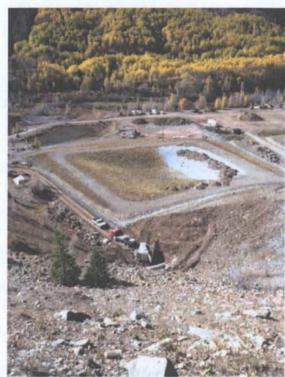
View west of Drill Hole AT-2 at toe of slope
